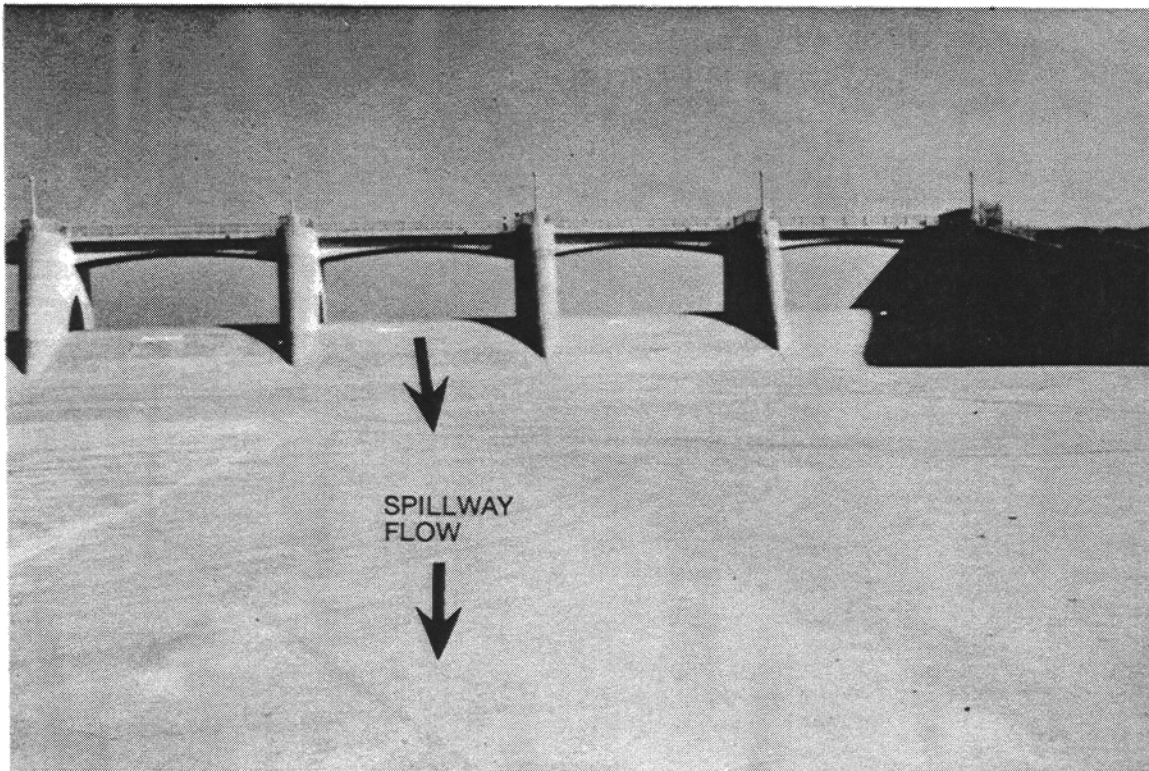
Spillway Apron (Spillway Outlet Channel), with portion of spillway in background (view from downstream, atop spillway apron).
